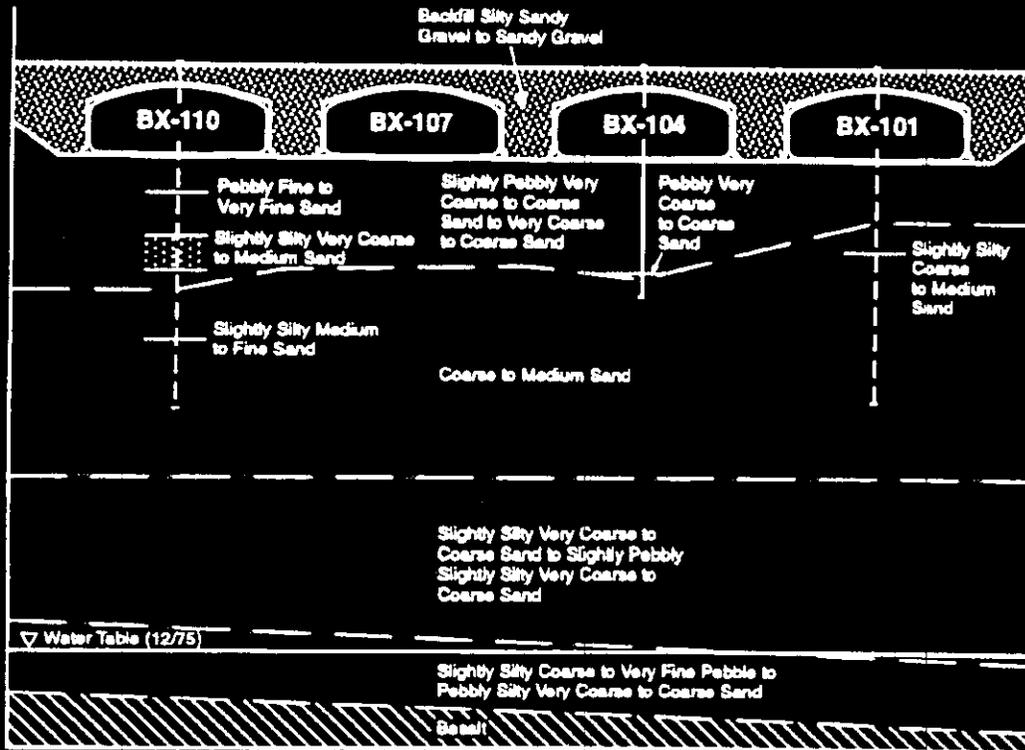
241-BX Tank Farm Vertical Section Layout.
